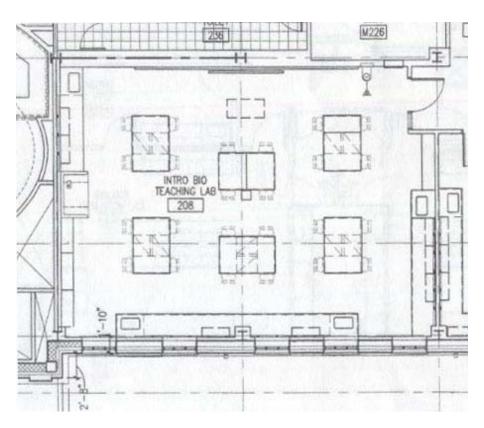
Second Floor Plan – Ecology Teaching Lab
